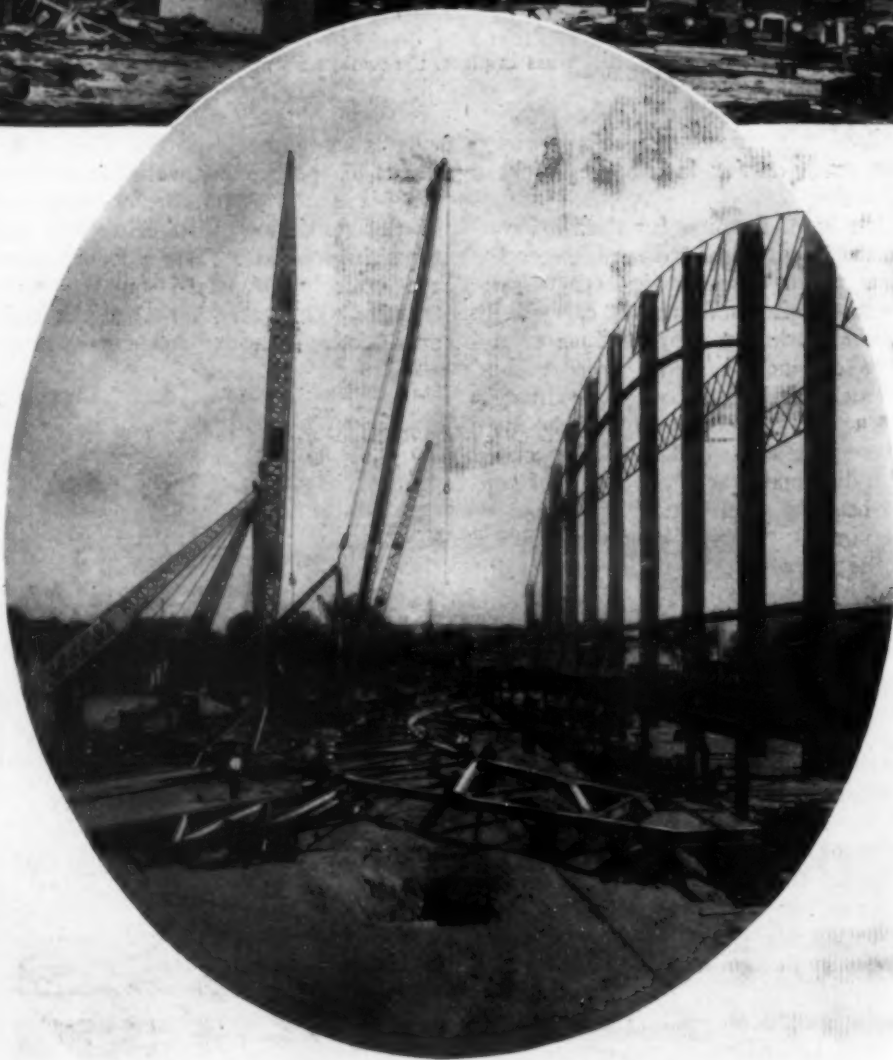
PLATE GIRDER COLUMNS, anchored in concrete at the foot and connected by trusses at the top, stiffen the free-standing brick end walls.
